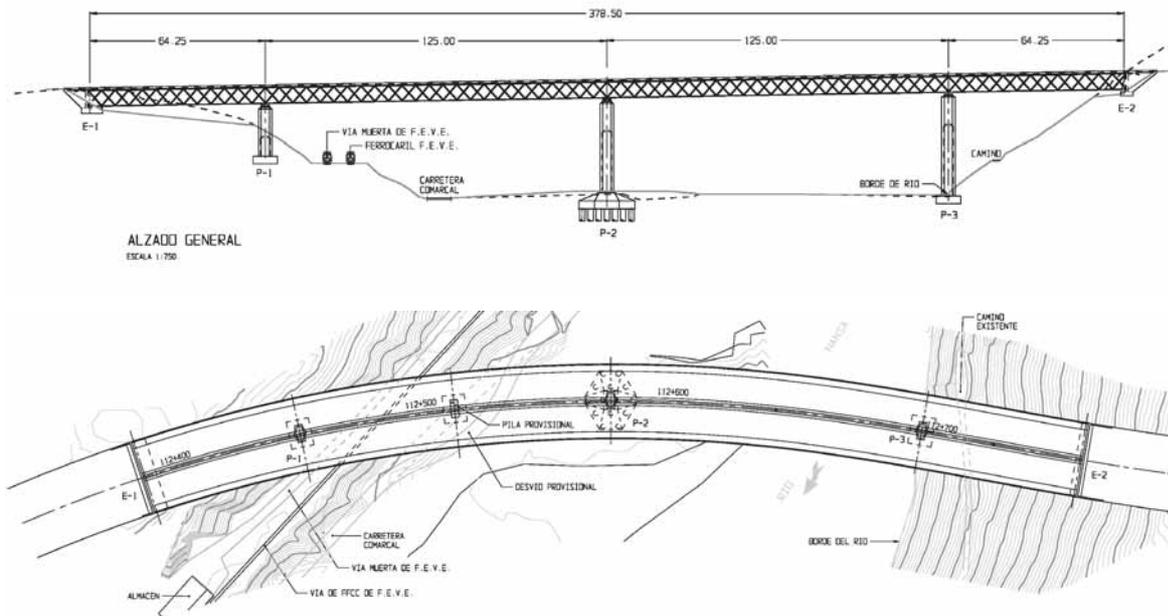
The viaduct of Tina Menor, elevation and plan view [56].
